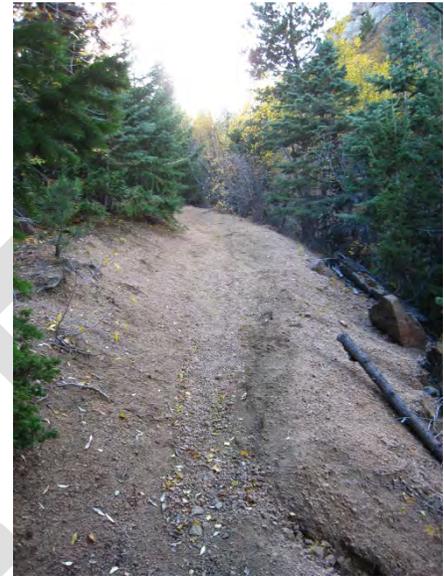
Erosion and downcutting in trail. Possible Solutions – construct 30 timber risers.
